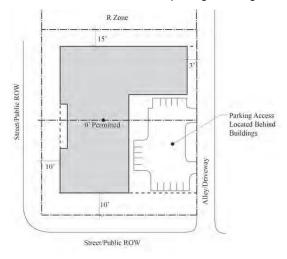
MU-3 (SP) Development Standard Diagram
